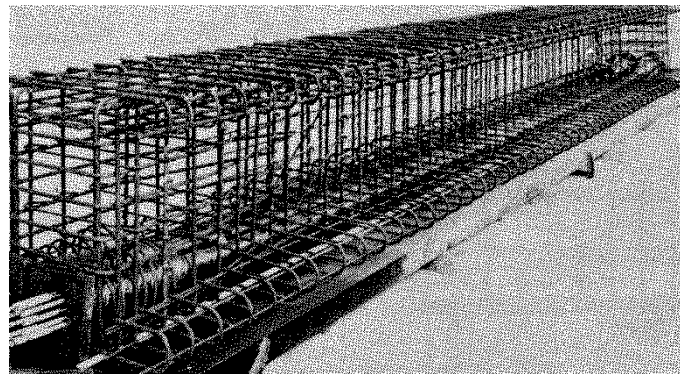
Case PB7. Reinforcement cage and prestressing cables.
